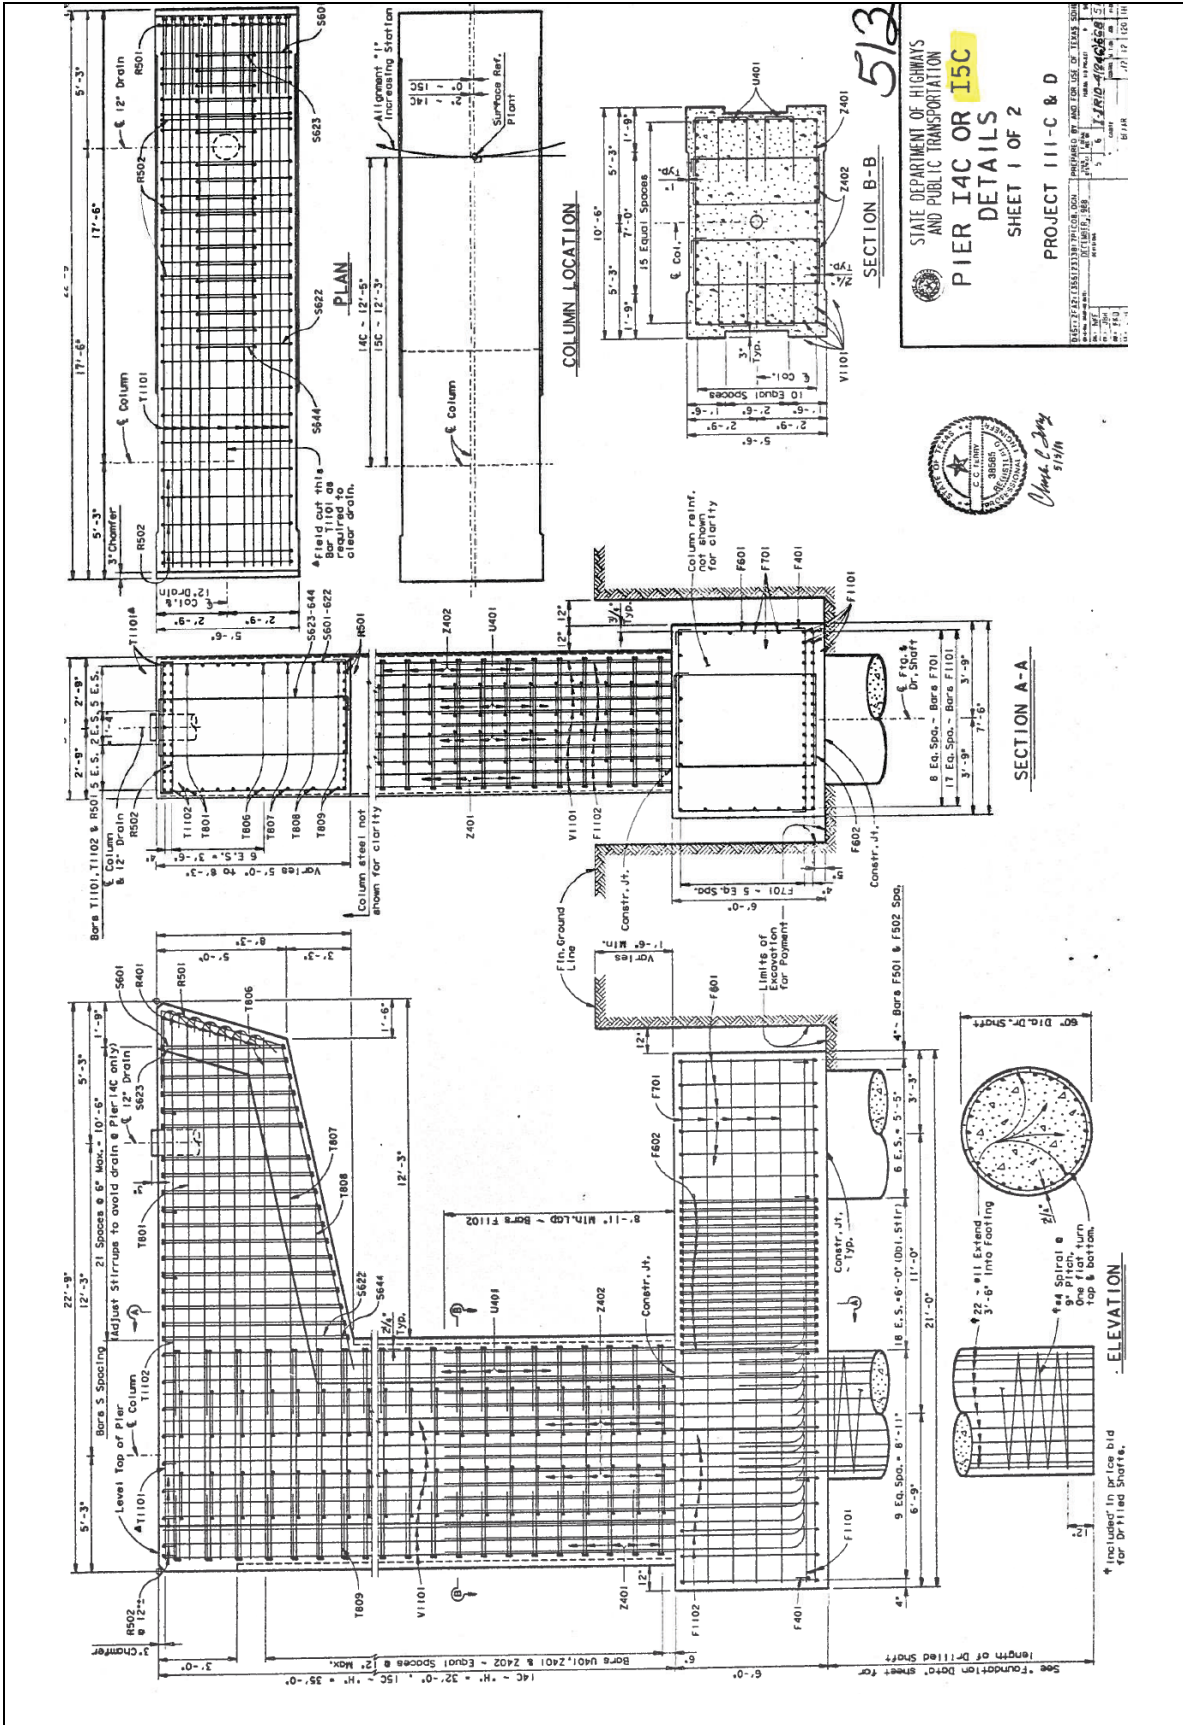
Layout and Reinforcement Detail of Pier I5C.
